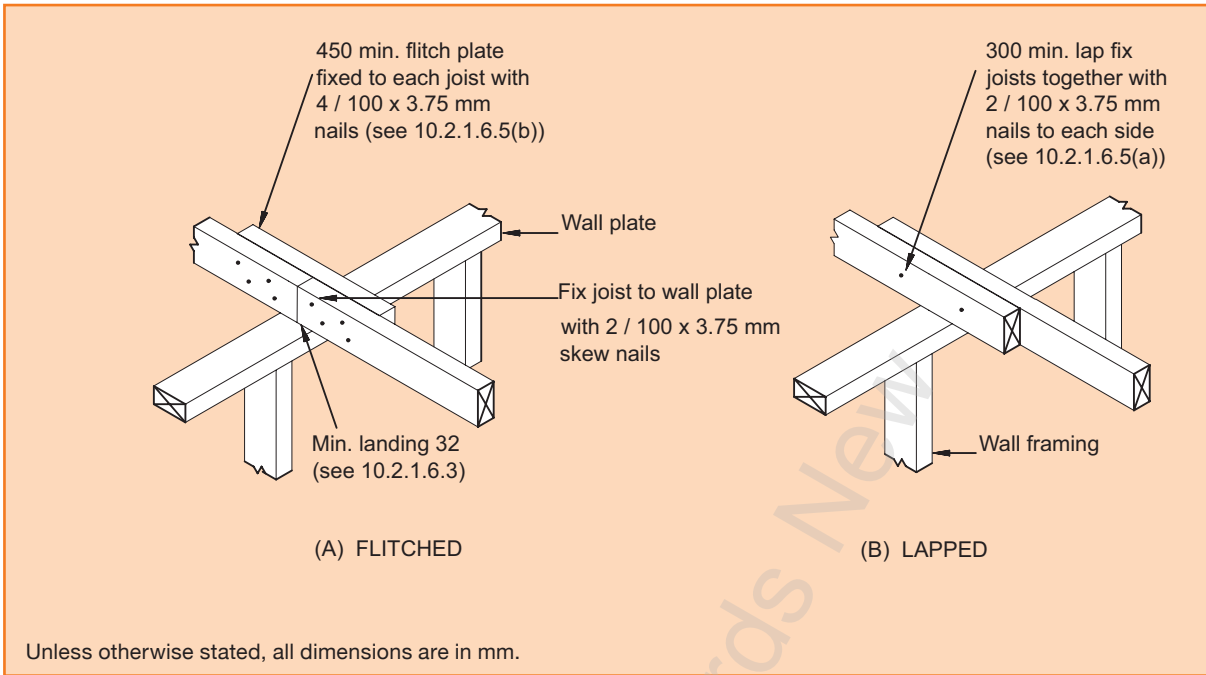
Joints in ceiling joists (see 10.2.1.6.5)
